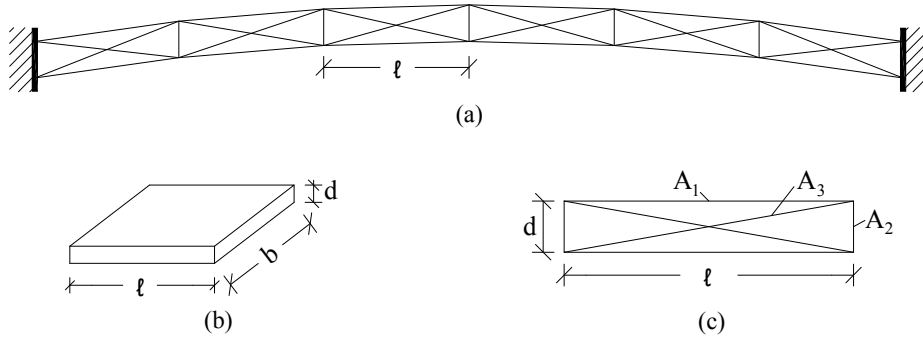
(a) Truss model of an arch, (b) an element of the arch under simulation, (c) a rectangular truss model element
